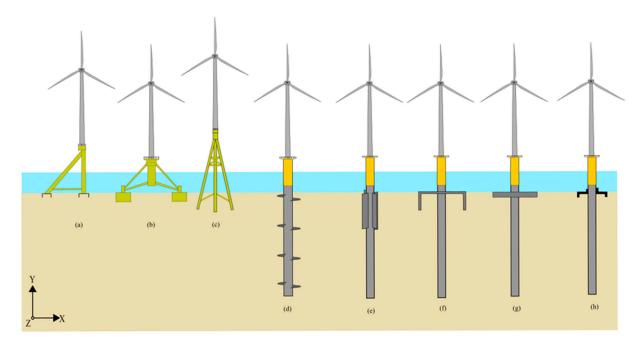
New foundations are either in use or proposed. Some examples: (a) asymmetric frame on suction caisson; (b) tetrapod/ tripod on shallow foundations; (c) twisted jacket; (d): helical monopiles; (e) winged piles; (f) collared monopile (caisson + monopile); (g) hybrid monopile with plate; (h) stiffened monopile (reproduced from [34]).
